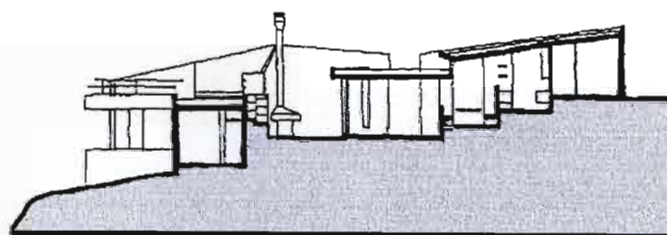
BDG – House Zietkiewicz (1975). Section.
